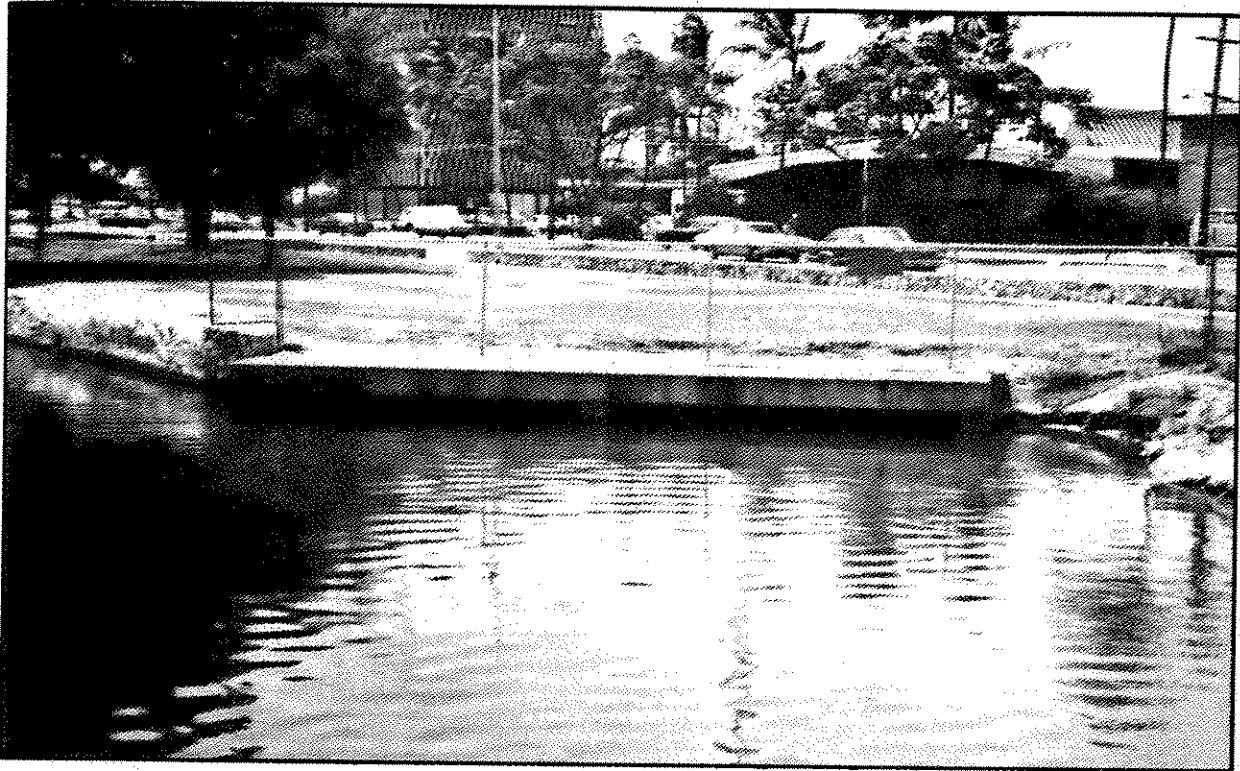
Pensacola Street drain outlet at the beginning of the project.
